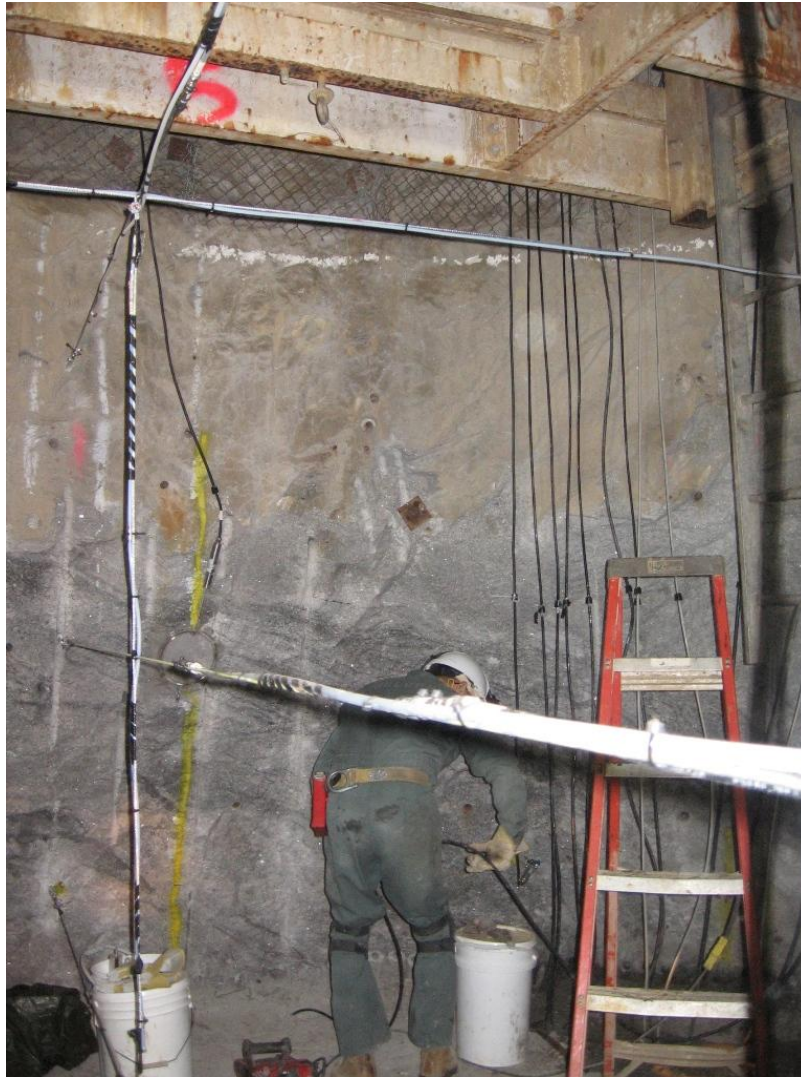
Installation of deformation sensors in the upper concrete component, looking north (AECL stock photograph)
